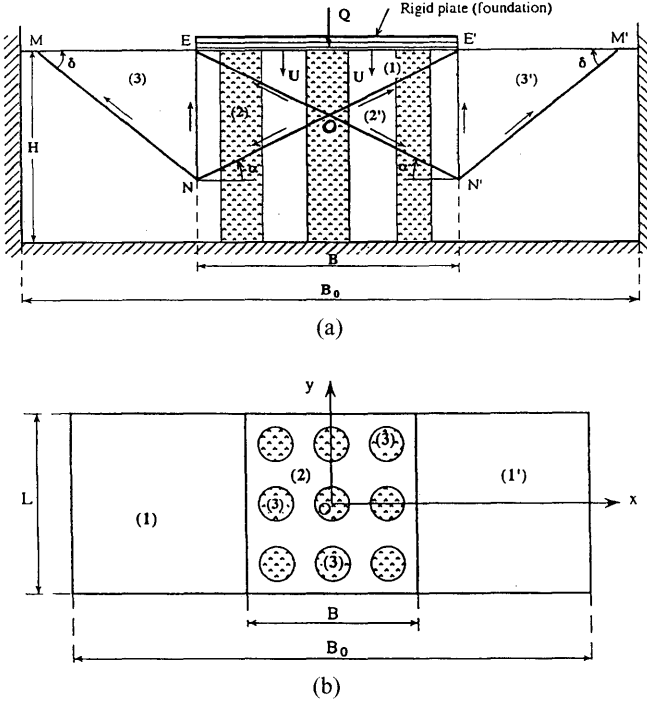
The failure mechanism with five blocks (a) cross section and (b) plane view
